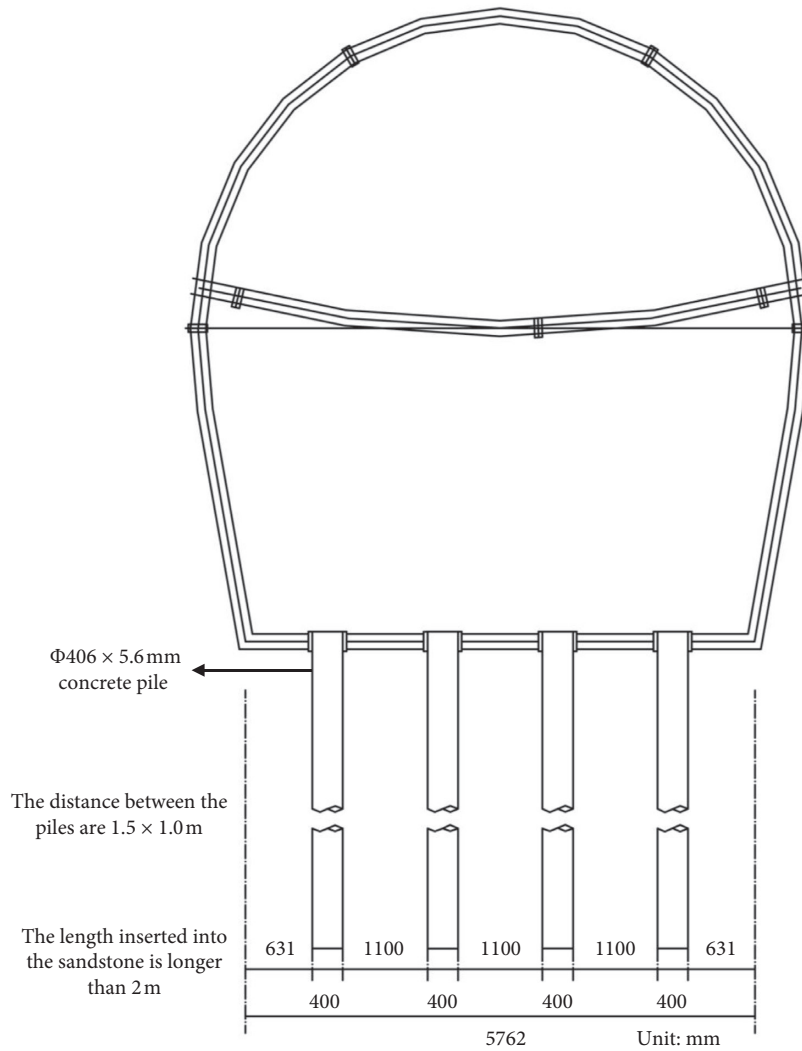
The reinforced section view of the steel tube concrete pile.
